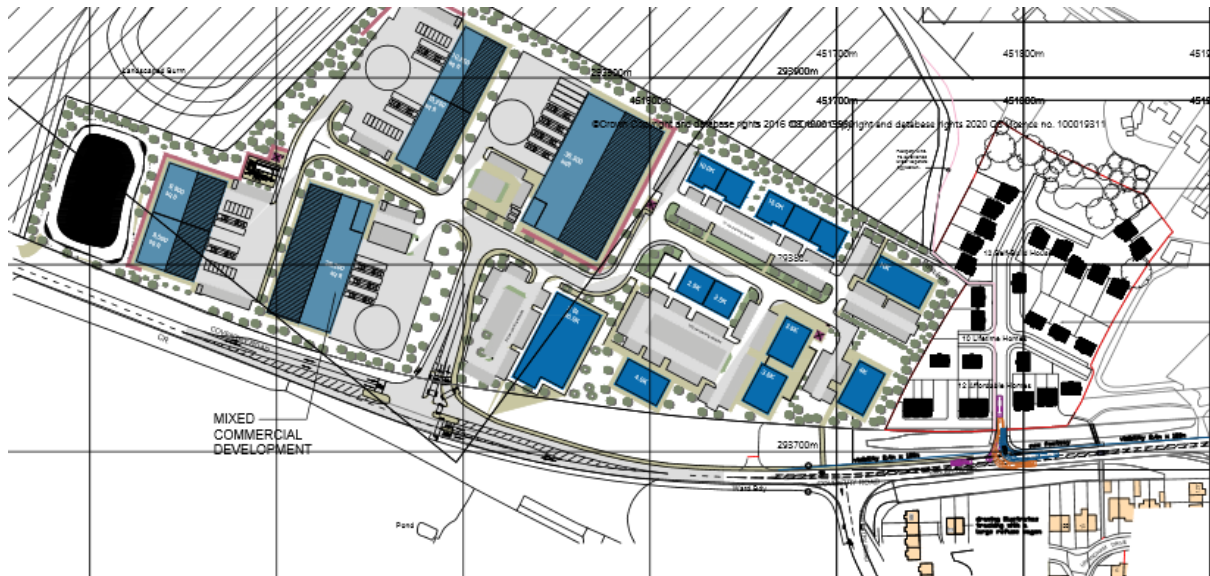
extract from (superseded) site layout plan, showing approved development to the west of the site
